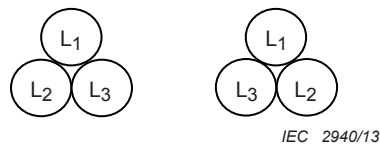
Recommended arrangement for installation of single core cables – trefoil configuration
